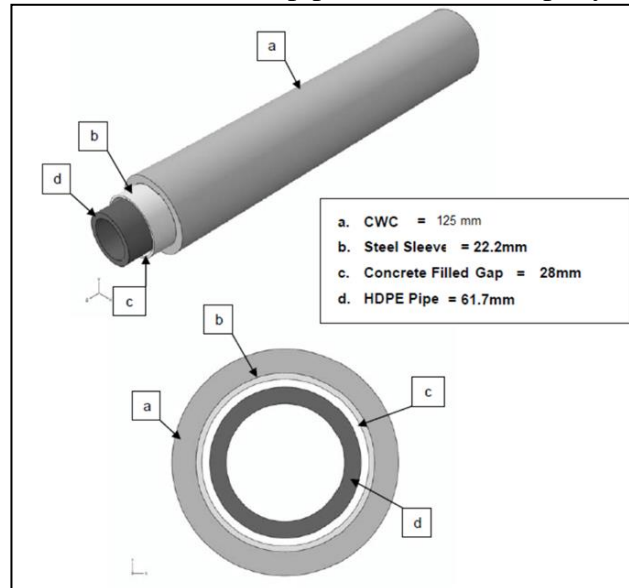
RNEST – Shore Approach – Pipeline Section Construction Details
